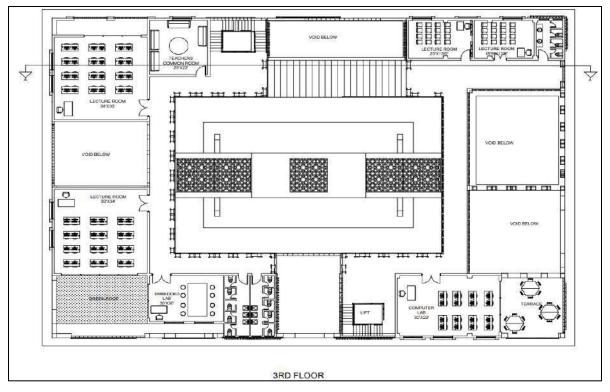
University building top view - Third floor (AutoCad 2022)
